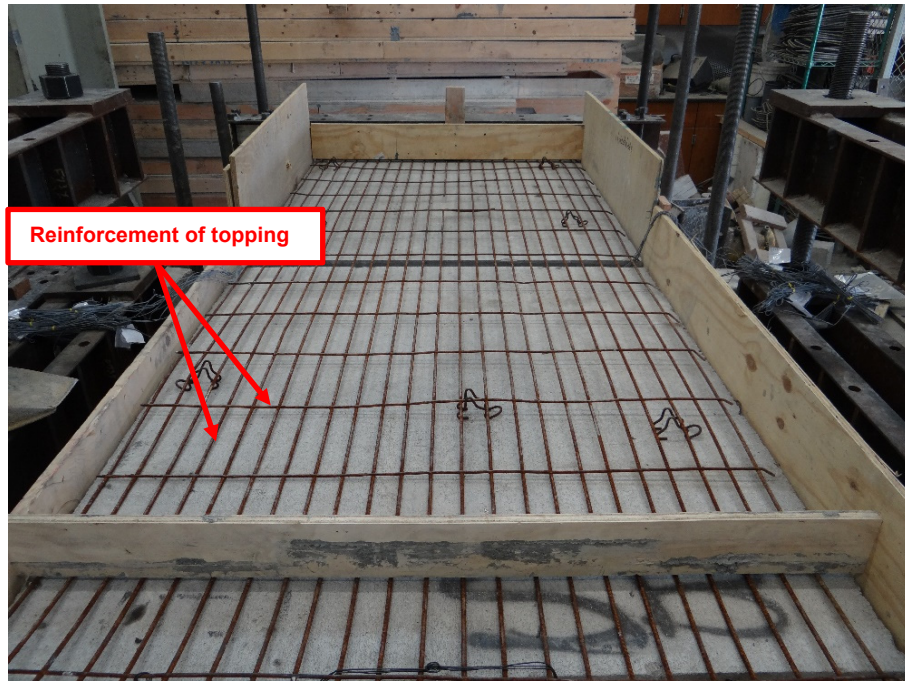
Steel reinforcement mesh of the concrete topping slab.
